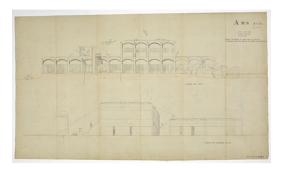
Southwest Elevation and Southeast Elevation (8 November 1952)²⁵
